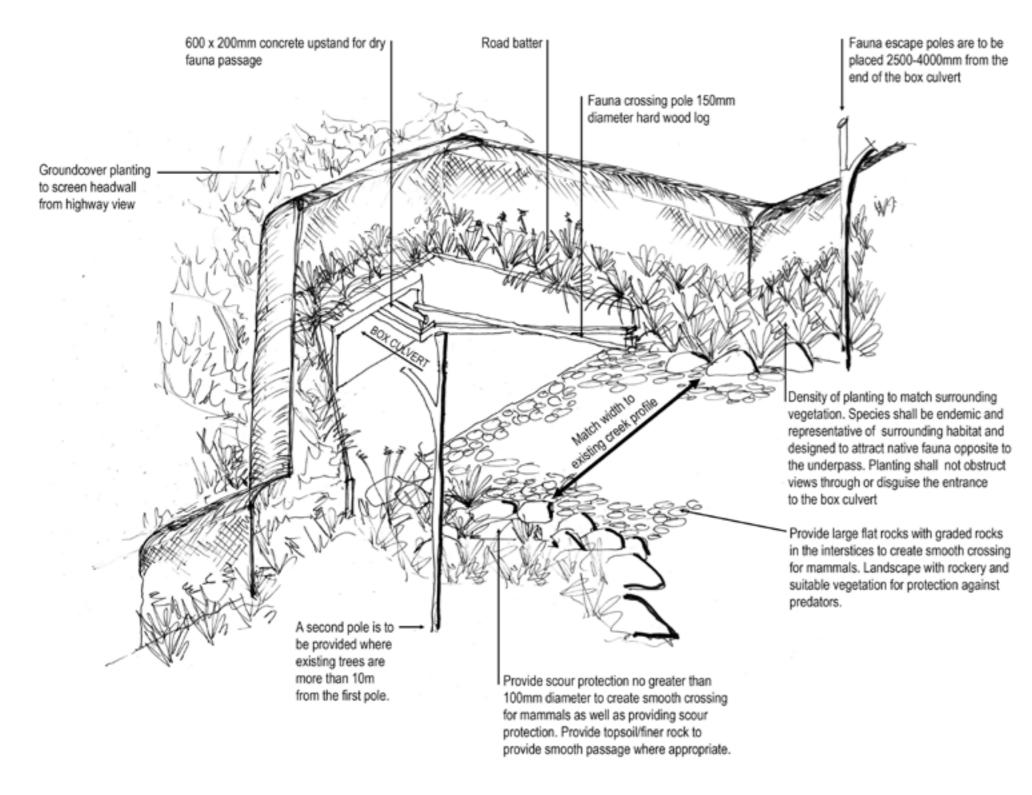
Typical landscape treatment for combined box culvert fauna crossing - sketch.
